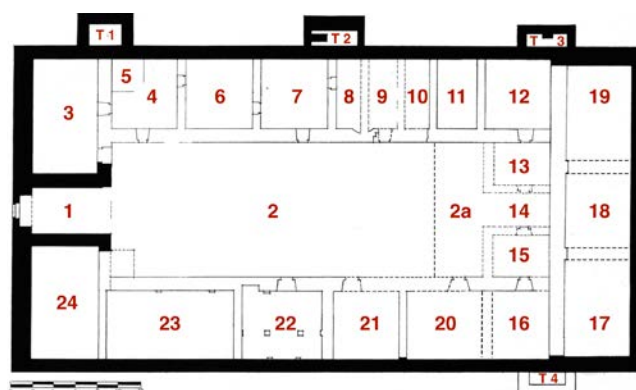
Gravina, floor plan with numbering (graphic redesign of floor plan by Ascani 1995, p. 219).
